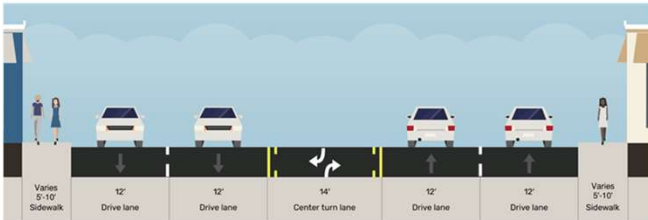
Typical Four-Lane Cross Section from Harbor Way to Kerber Drive Facing South
